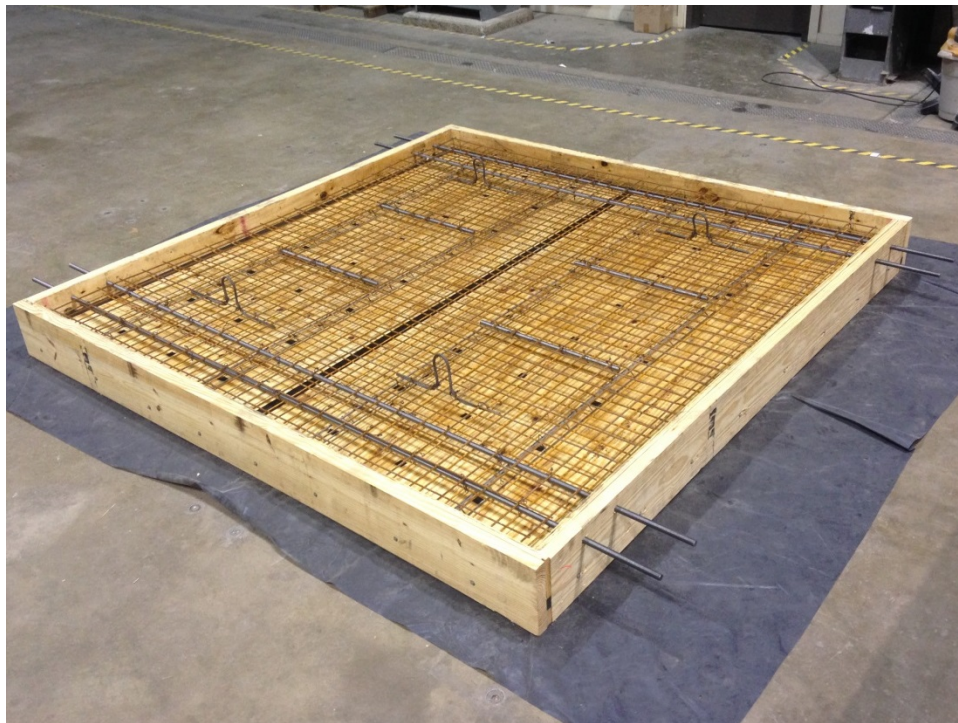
Plan View of Reinforcement in PCP for Test 4
